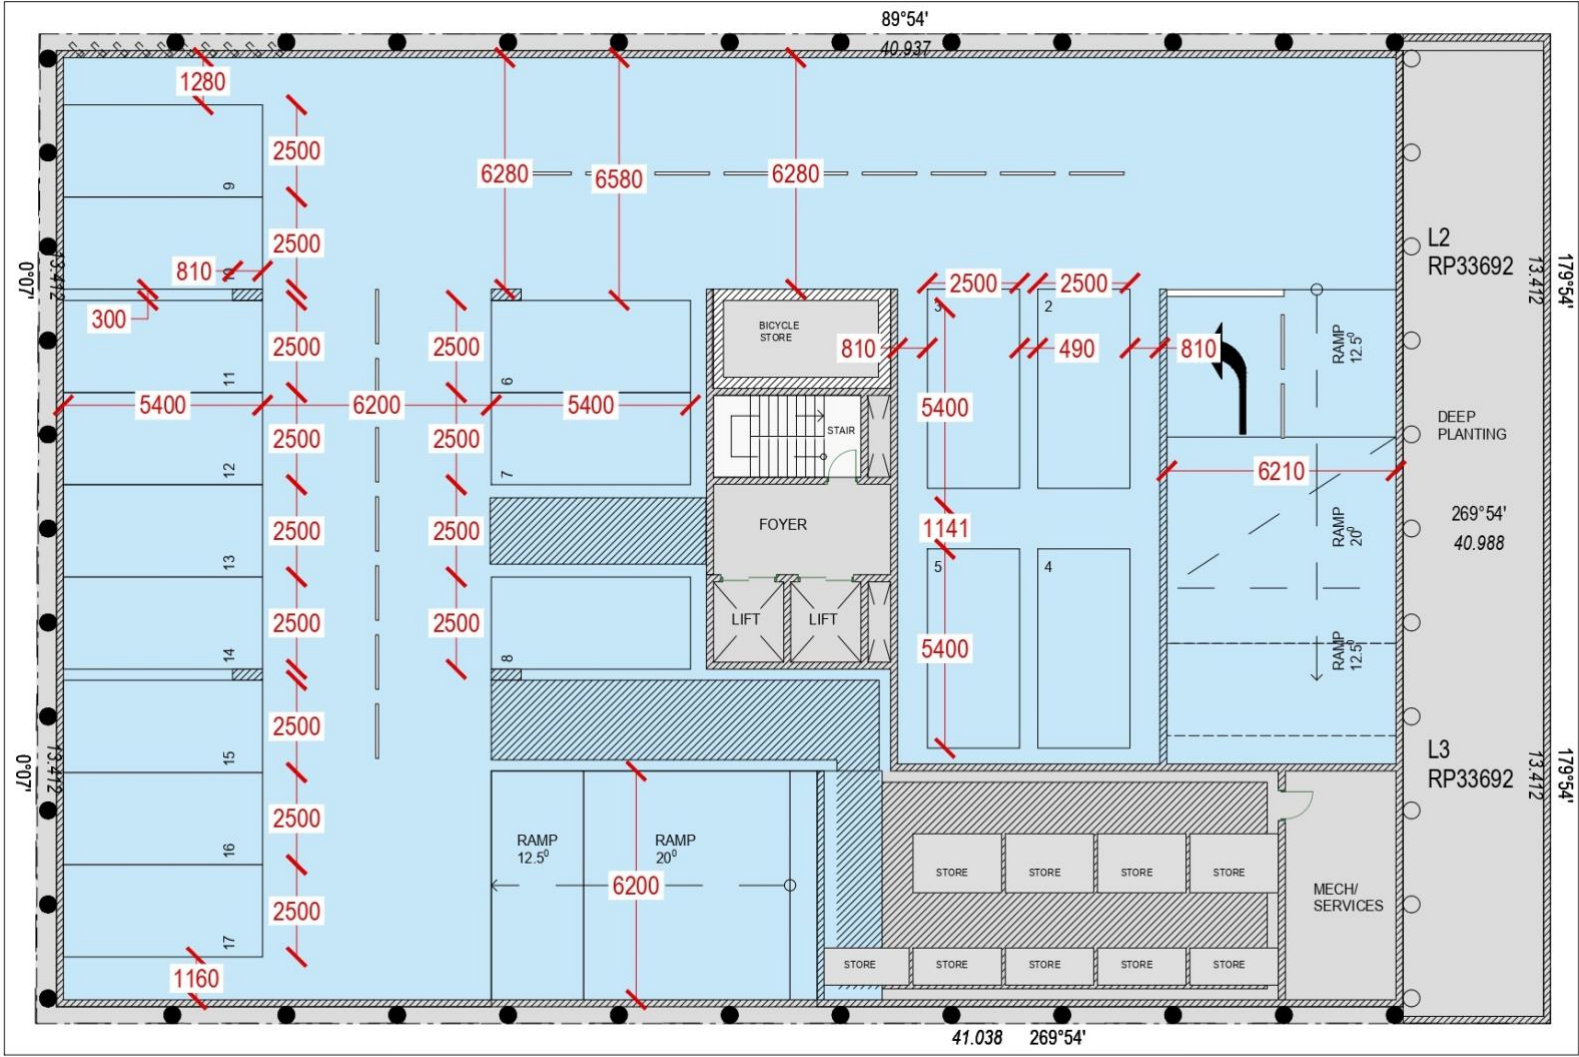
DIMENSIONED CAR PARKING (BASEMENT ONE)
